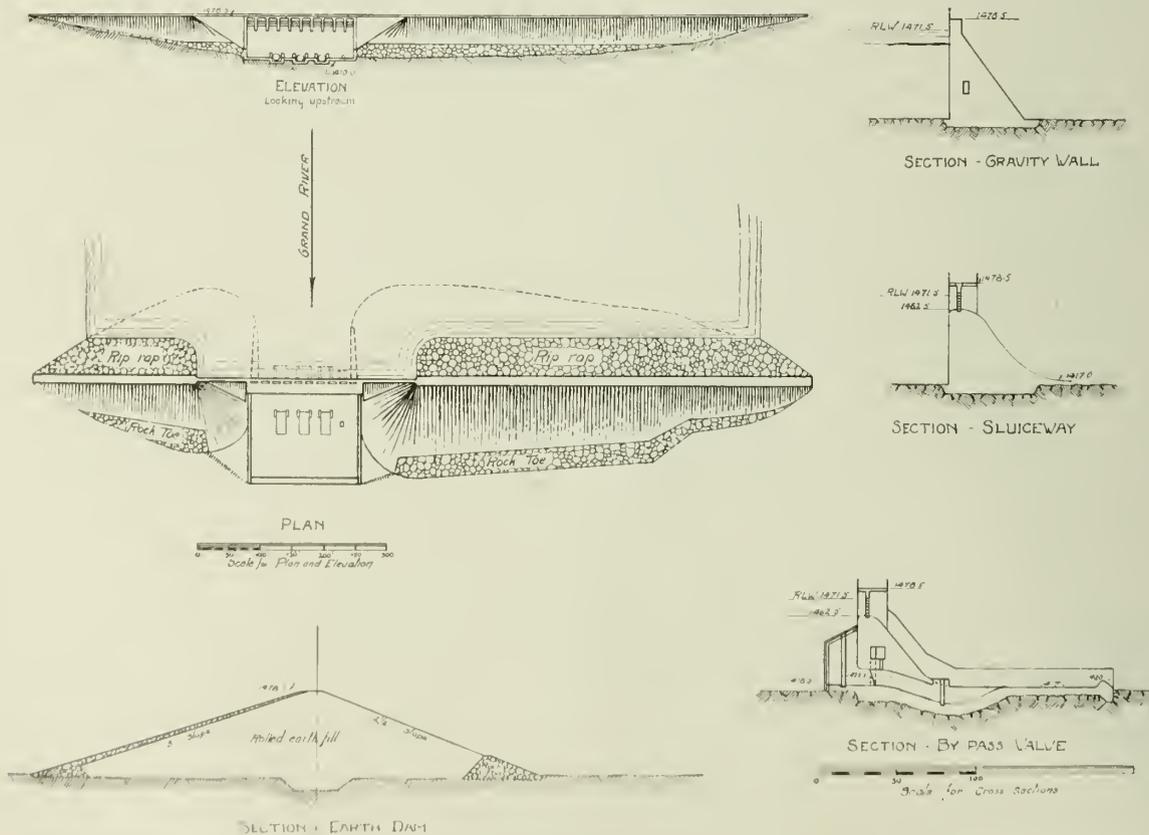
Grand River Conservation Project. Preliminary Plan of Proposed Waldemar Dam.
